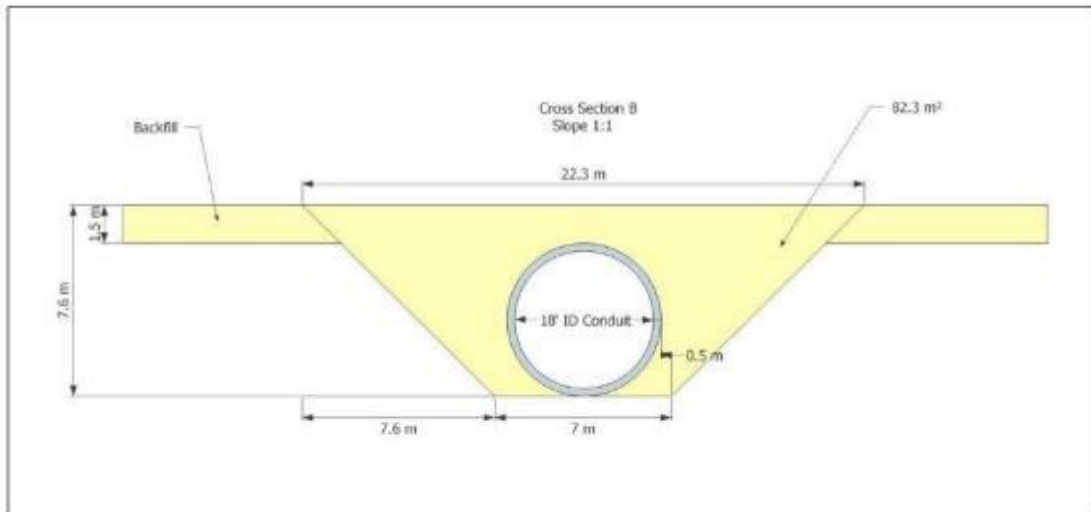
Cross-section B showing trench for removal of 18-ft (6-m) ID discharge conduit with side slope 1:1.
